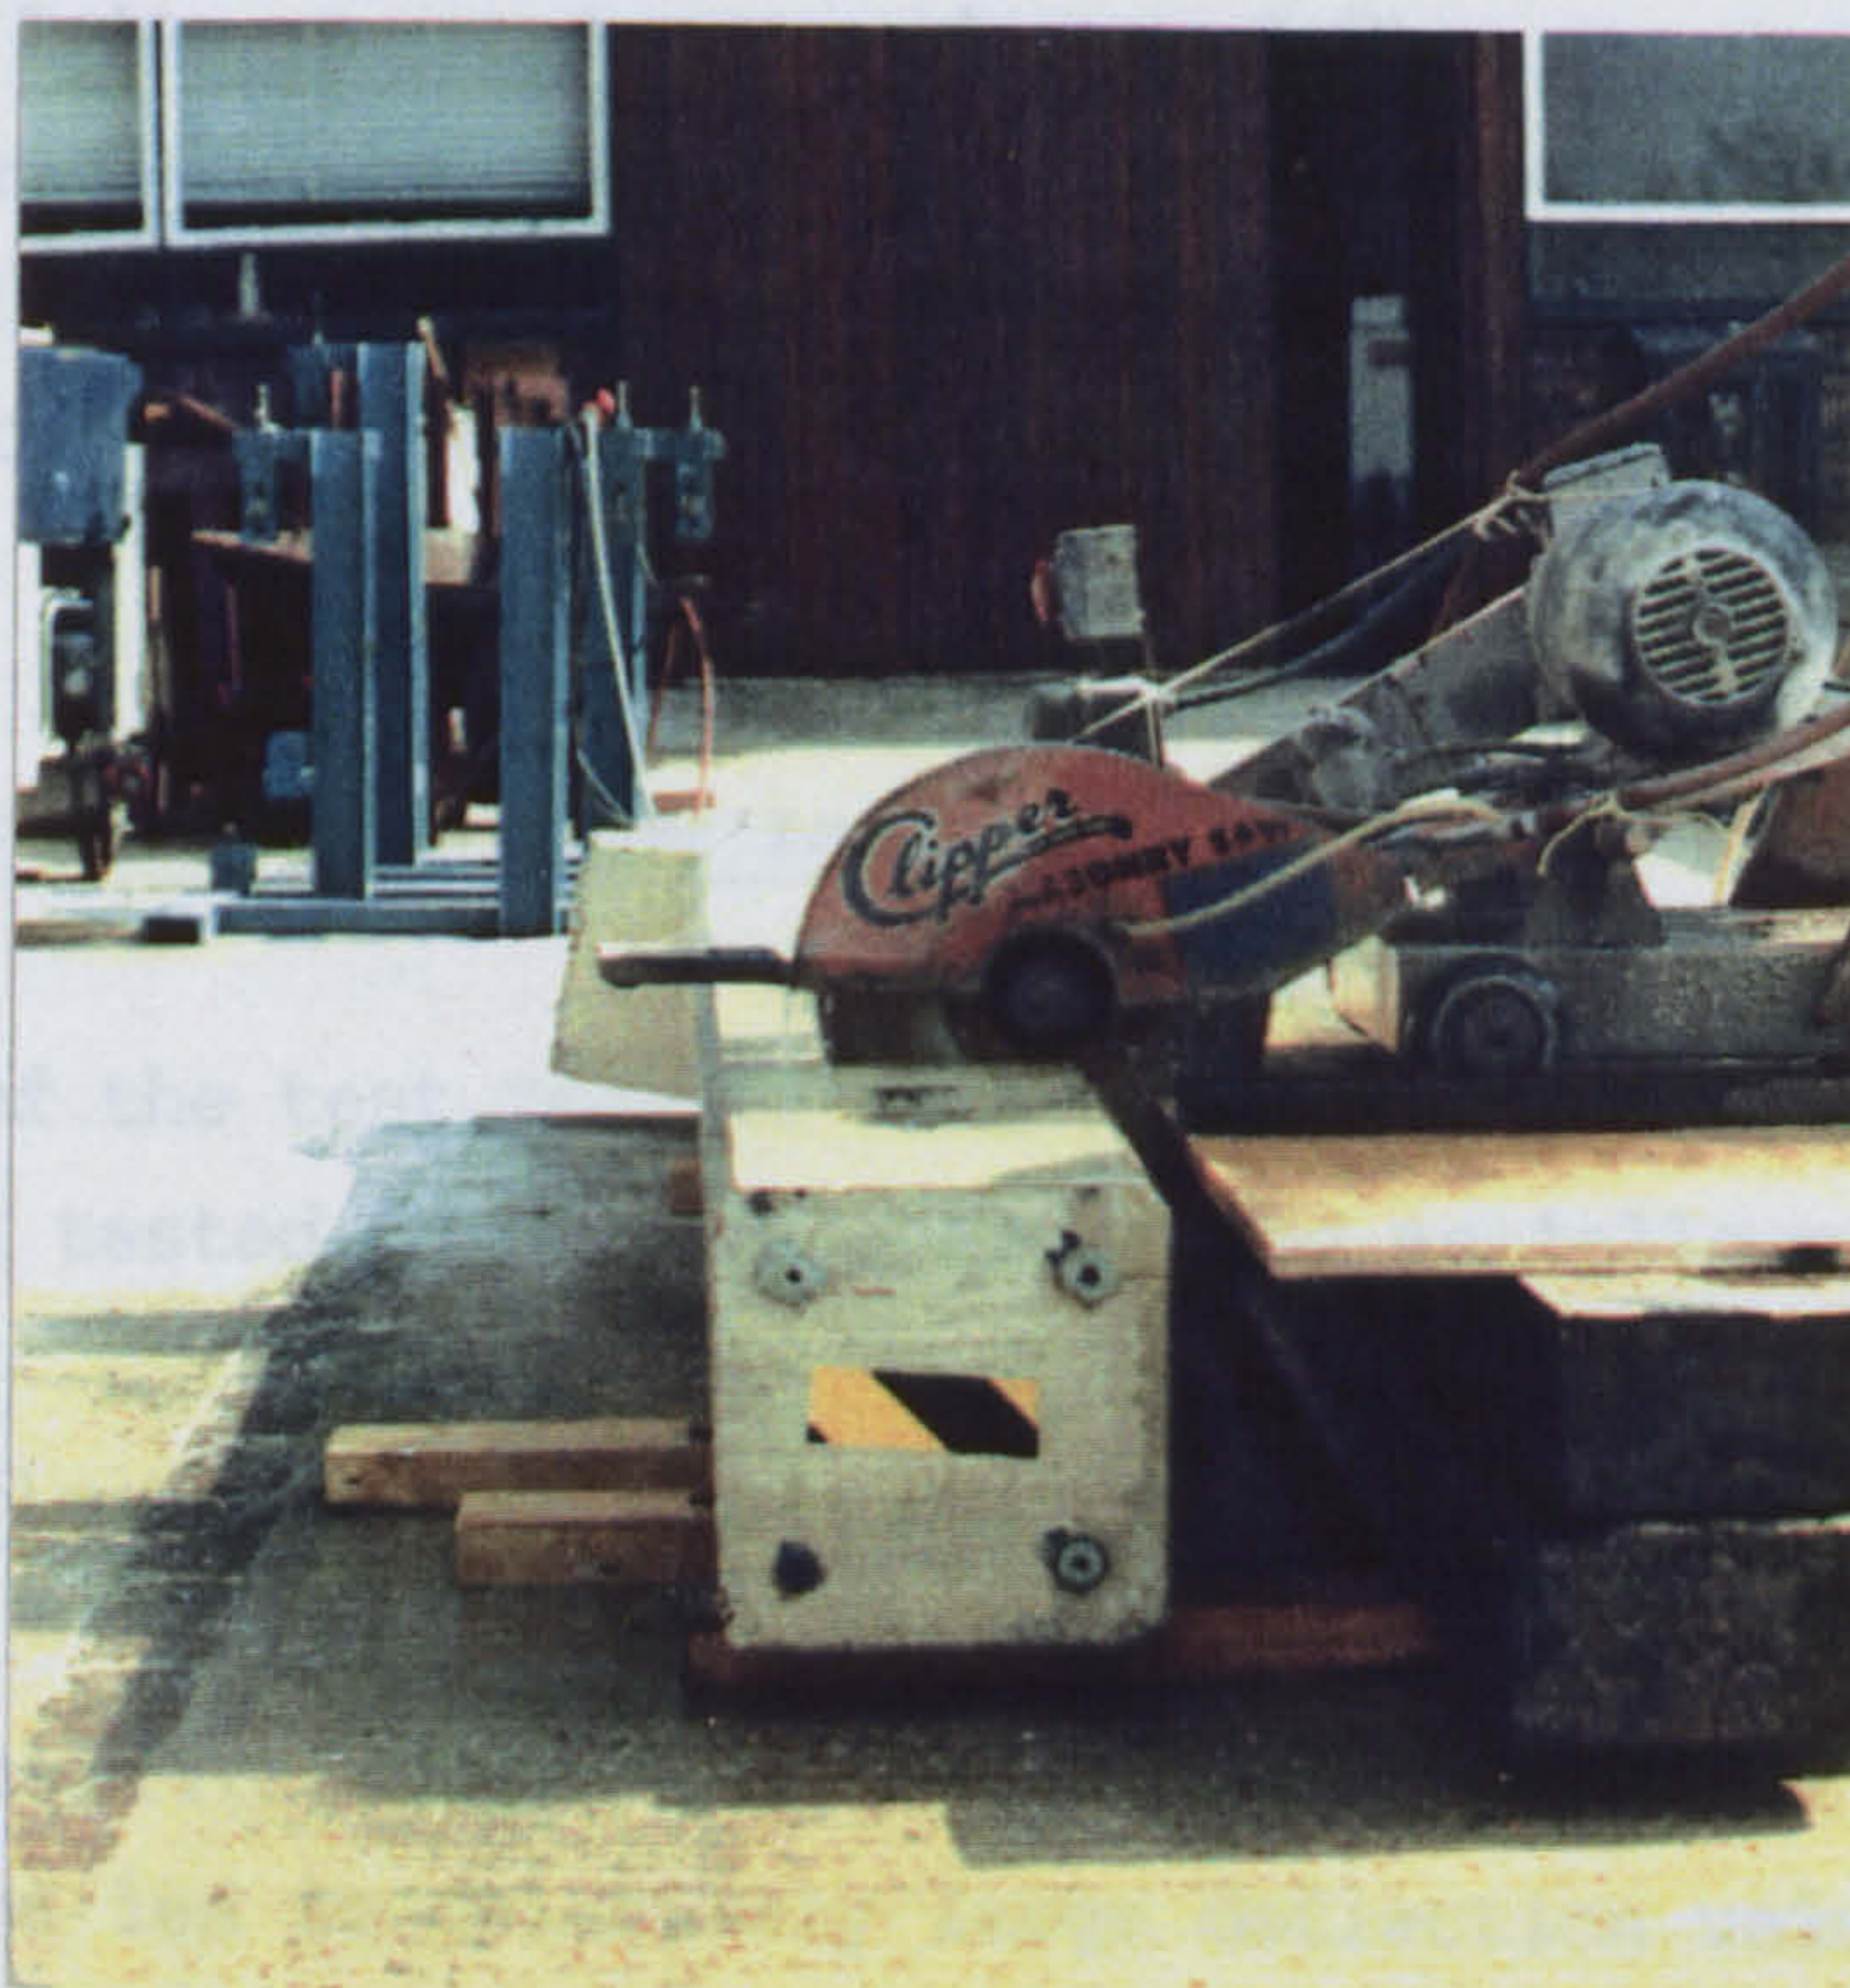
MASONRY SAW CUTTING THROUGH THE COLUMN AT A MARKED
